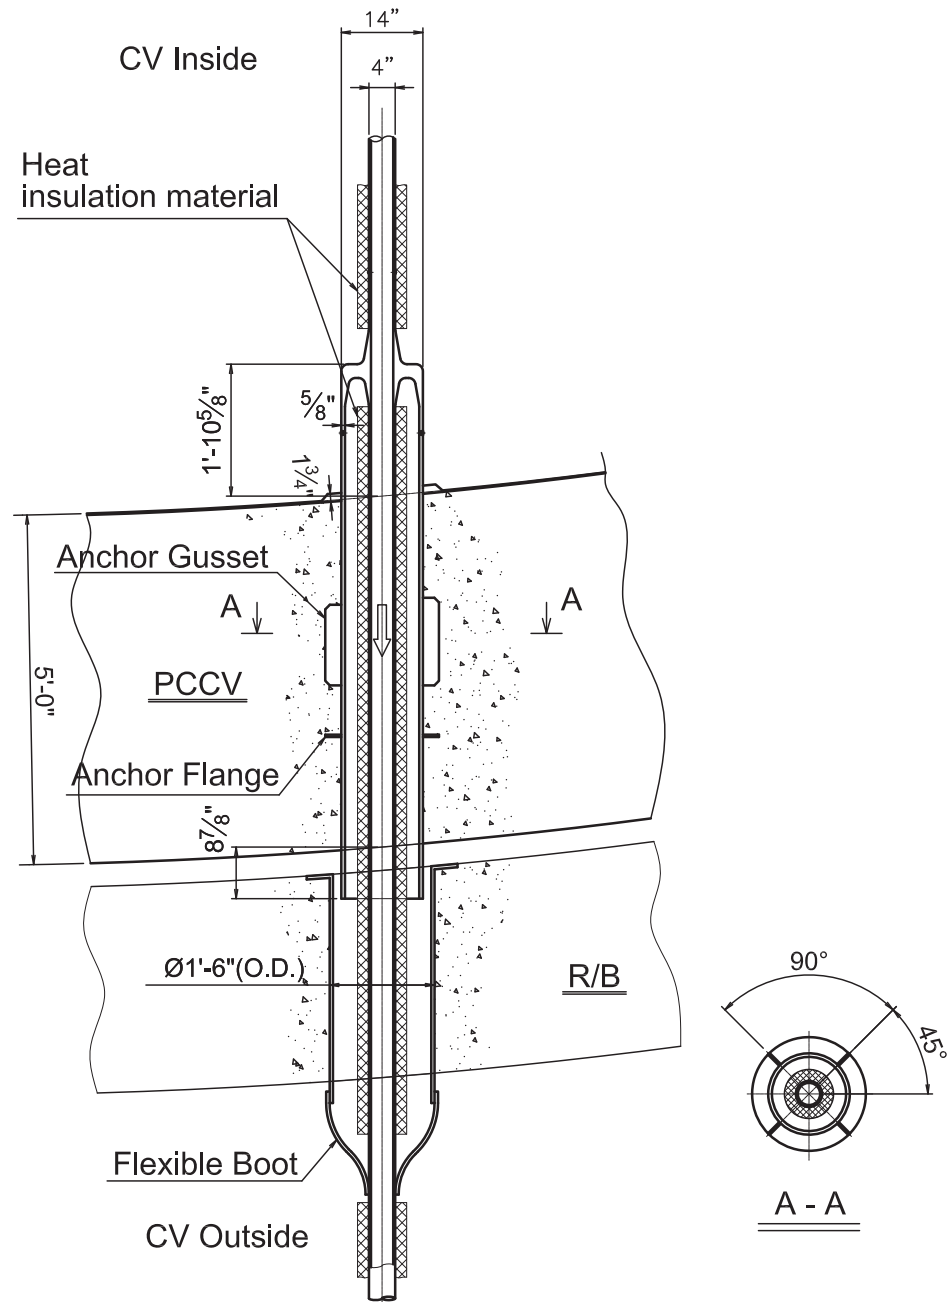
Containment Penetrations (Sheet 13 of 17)
